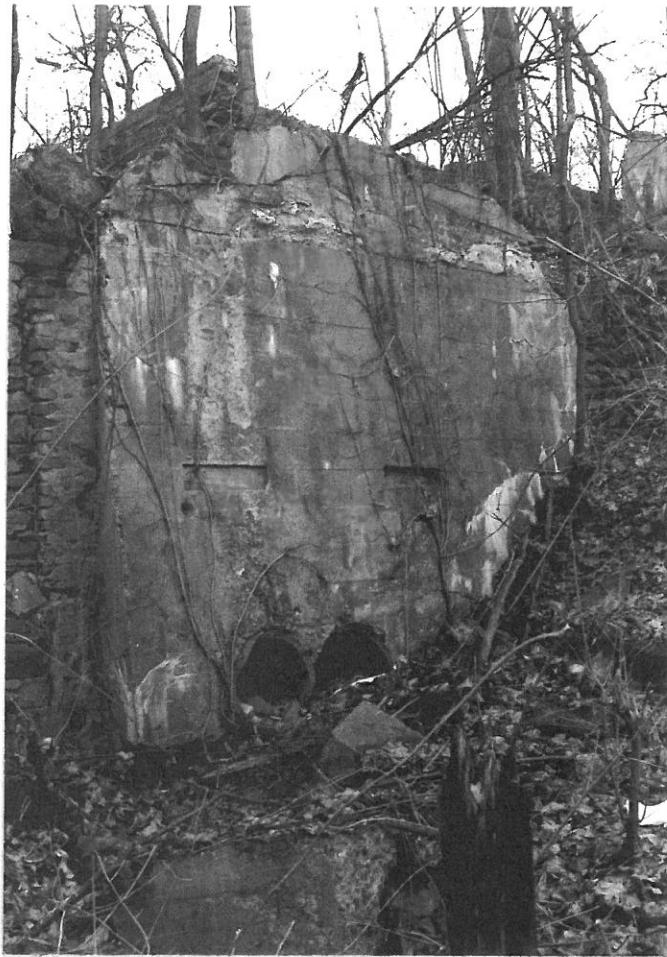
CONCRETE IN-FILL AT PROBABLE HEADRACE ARCH SITE, HARRIS MILL
